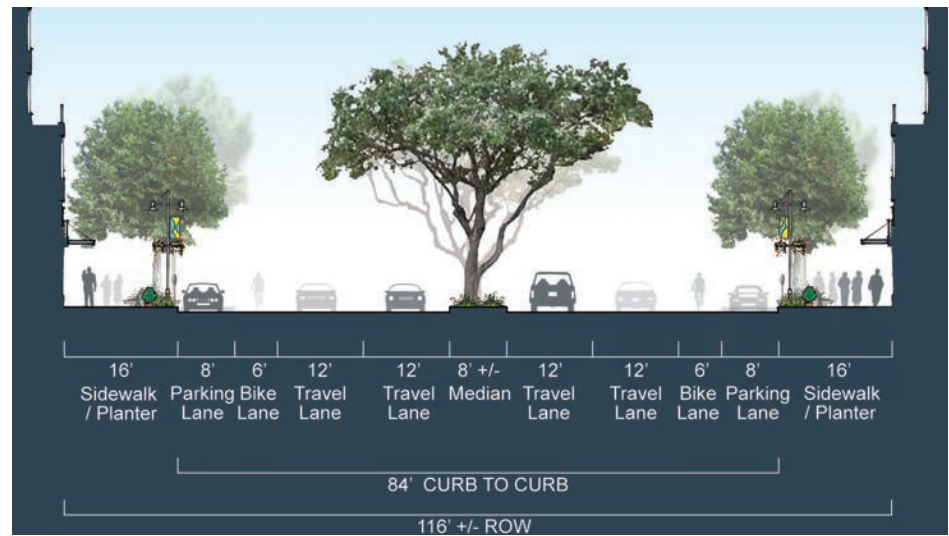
SALT LAKE BLVD - SECTION OF POTENTIAL ENHANCEMENTS
